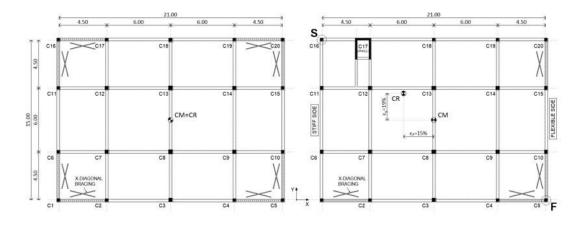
Typical layouts for the 3-story and 5-story buildings[17]
